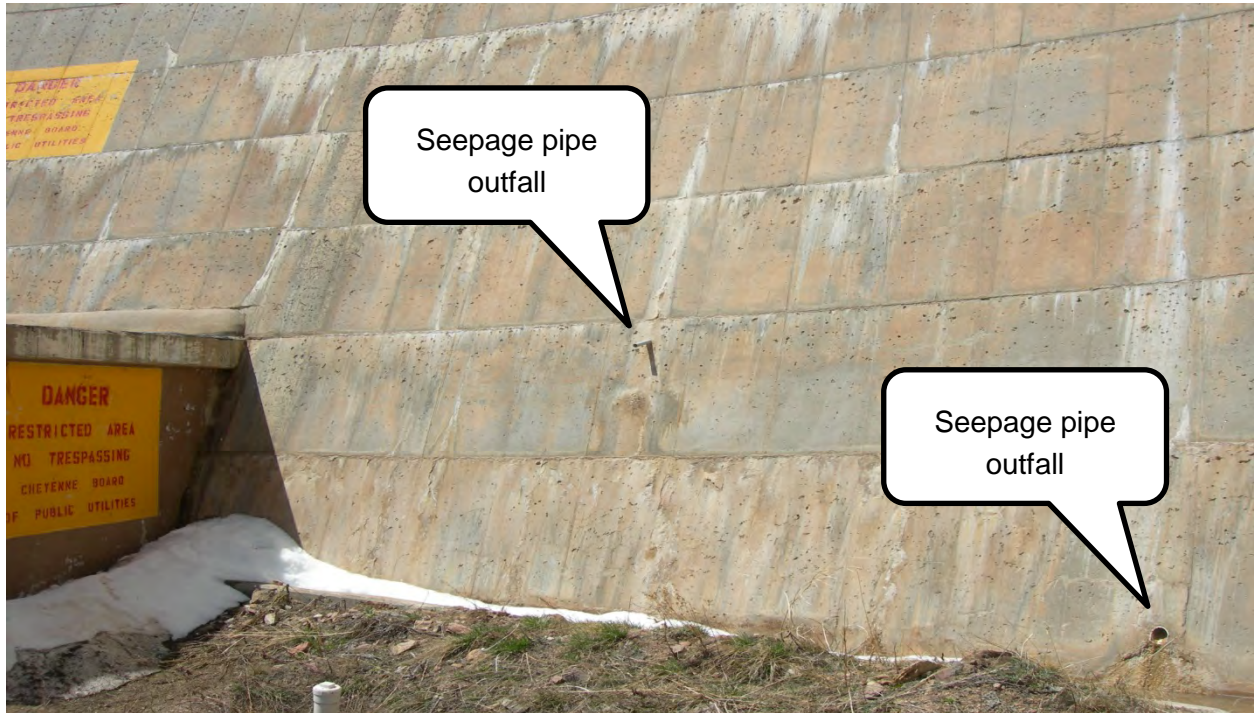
Internal seepage pipes to the left of outlet works building. Calcium deposits developing below the pipe in the bottom right. (May 6, 2013)
